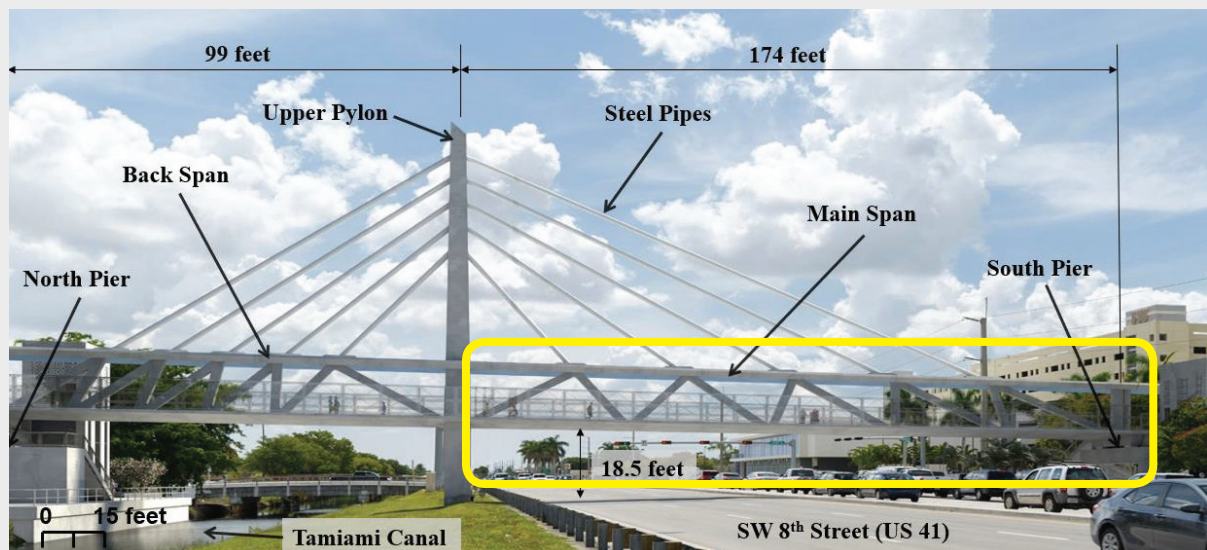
Rendering of what the signature pedestrian bridge would look like, showing the main span outlined (Source: NTSB Factual Report, with the added outline)
